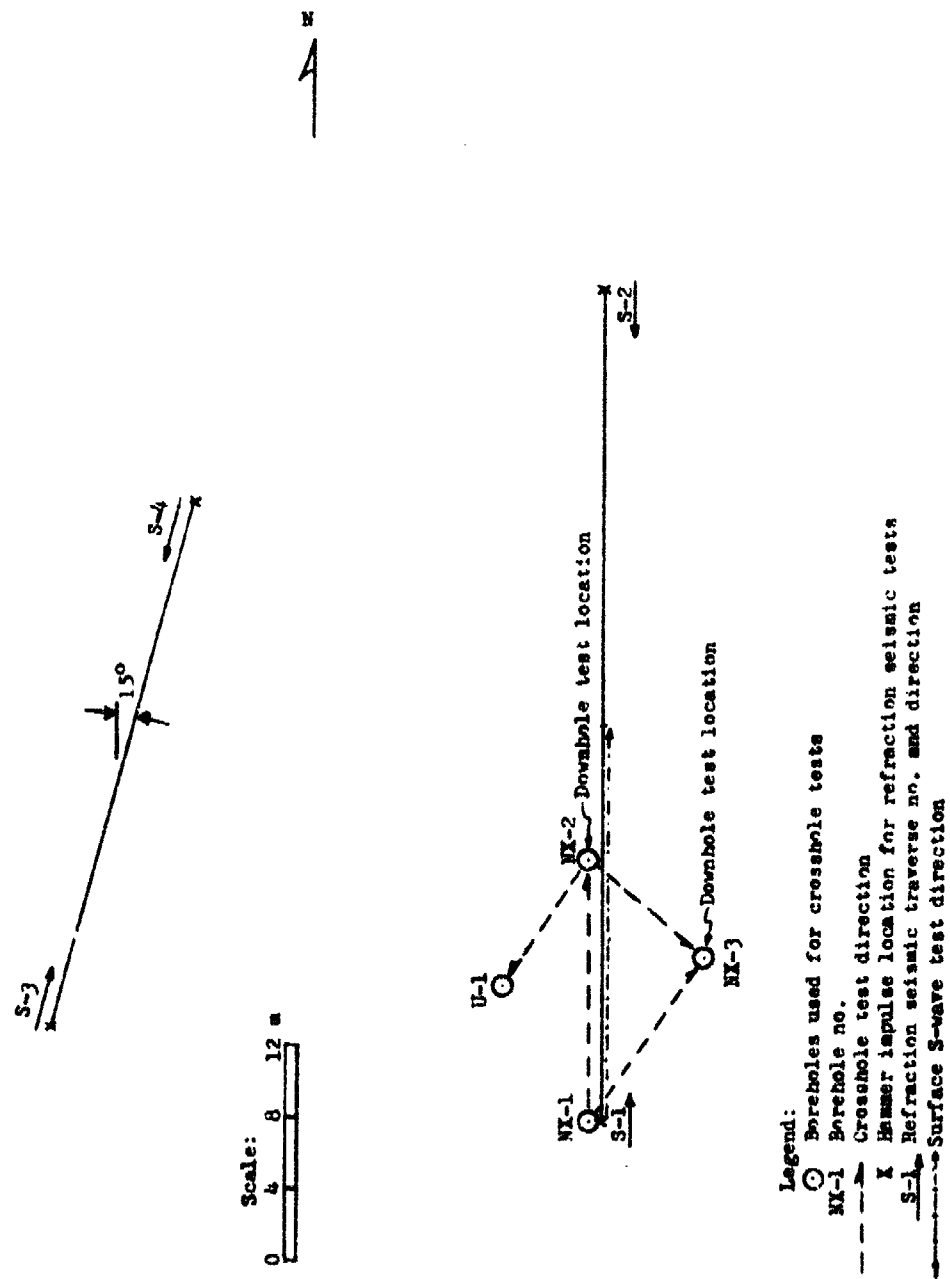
Plan view showing crosshole, downhole, surface S-wave, and refraction seismic test layouts.
